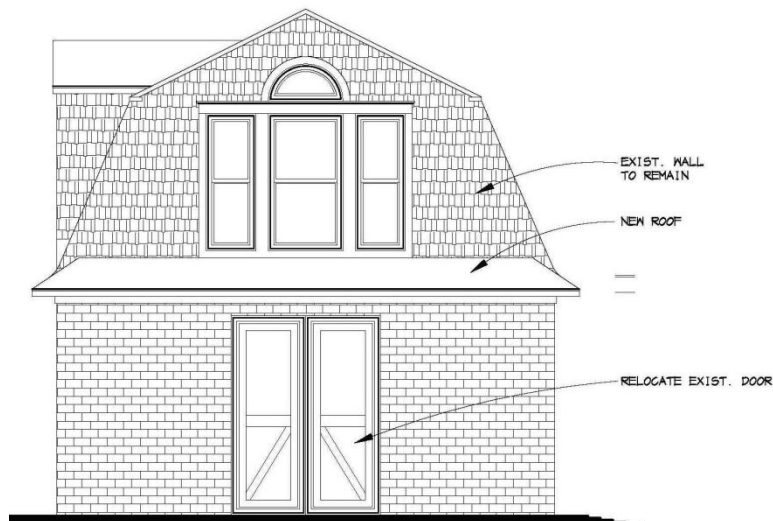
541 Highland Ave., proposed east elevation, (existing view of east elevation not provided by applicant) 2015.
